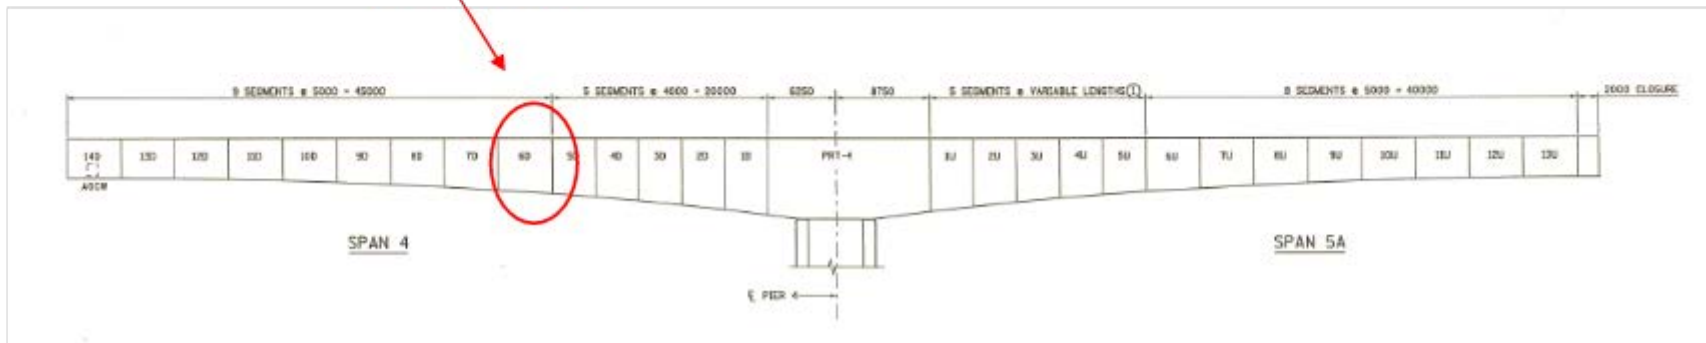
Elevation of MnDOT Bridge 82855 with instrumented Pier s 2 and 4 [10].
